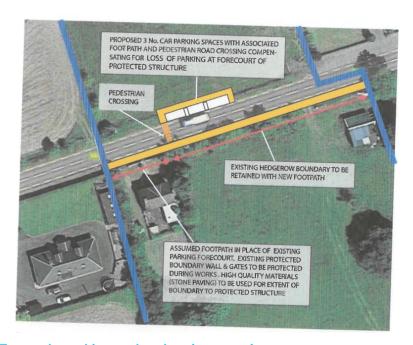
Footpath, parking and pedestrian crossing arrangement proposed in submission
